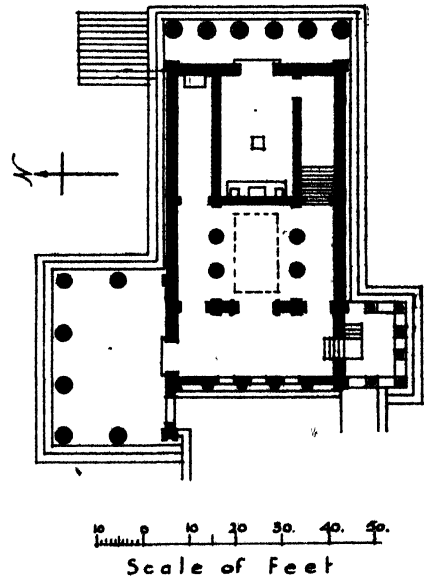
PLAN OF THE ERECHTHEION, ATHENS
